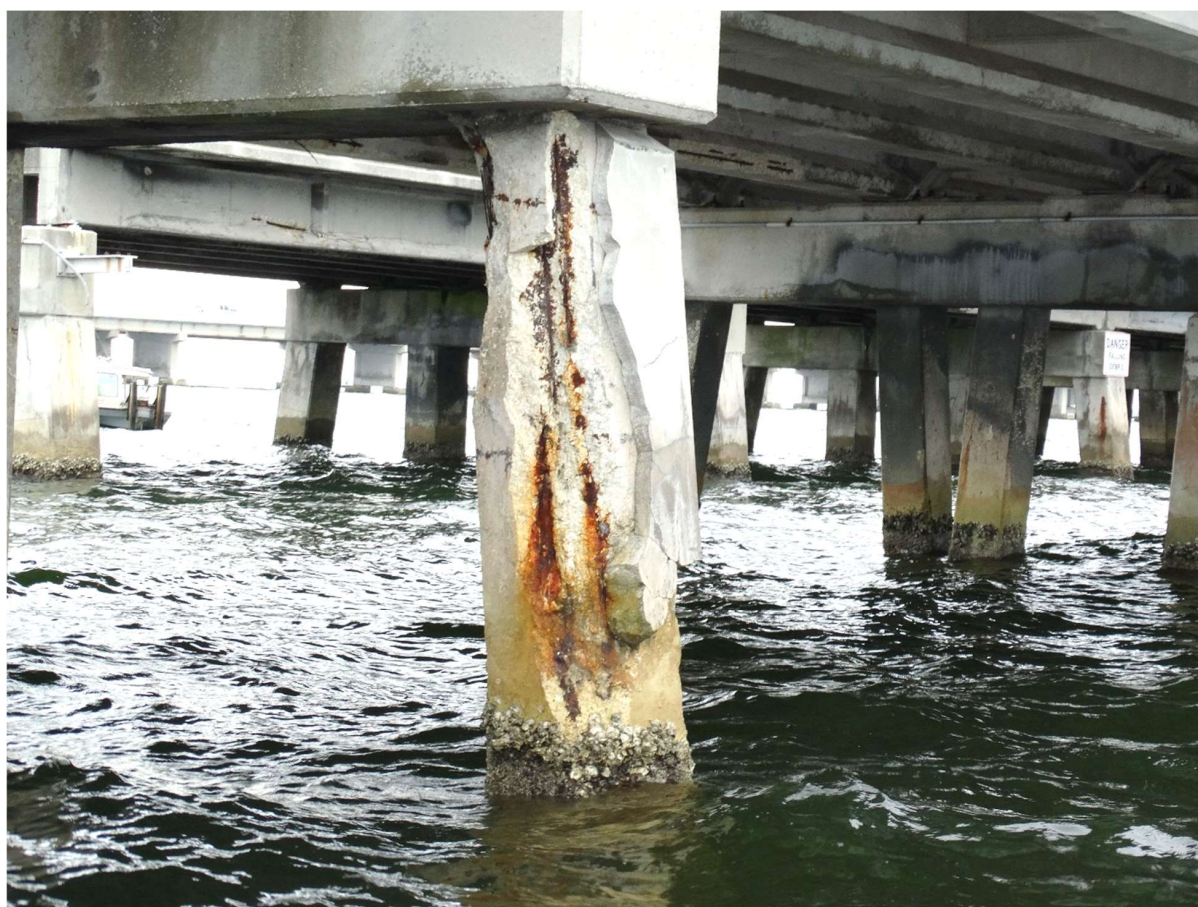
Failed nonstructural pile jacket repair. This repair method was commonly used from the 1970s through the 1990s.
